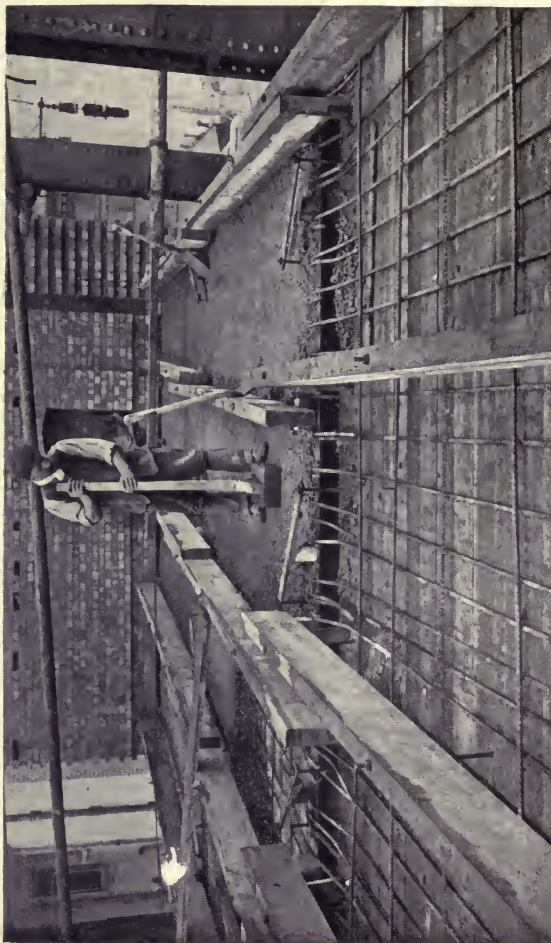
VIEW OF FLOOR SHOWING USE OF INDENTED BAR.
